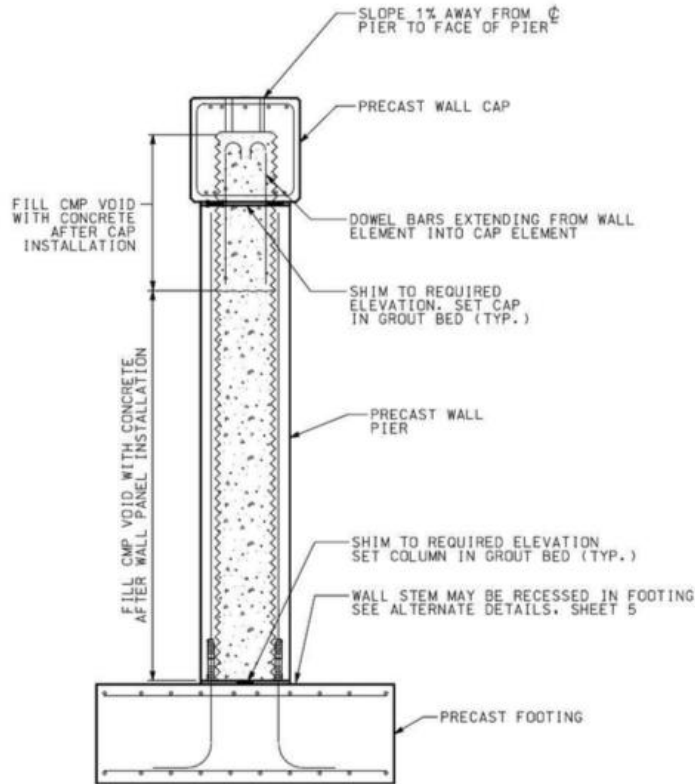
Example of wall pier design using PBES. (Culmo, et al., 2013)
